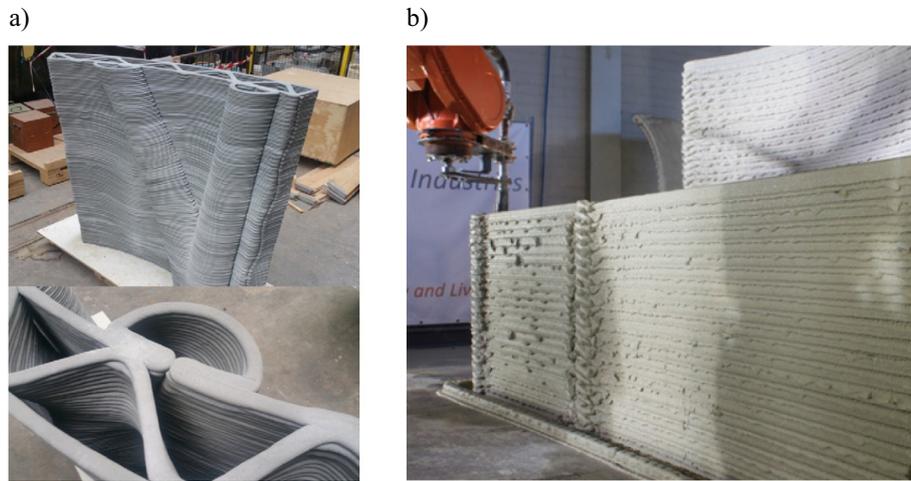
Examples of 3D printed concrete walls. a) Concrete wall by Gosselin [112], b) Concrete wall by CyBe [114].
